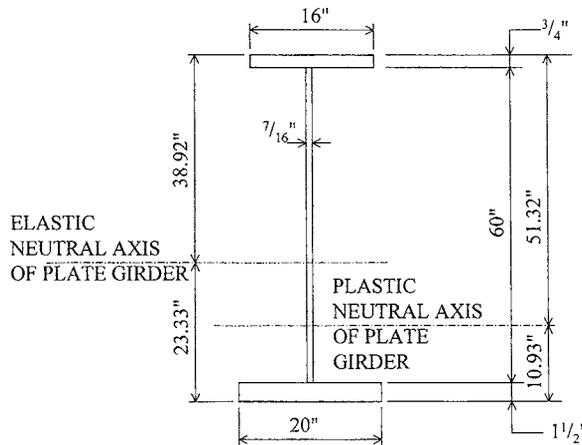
Cross section assumed for plate girder for LRFD example.
